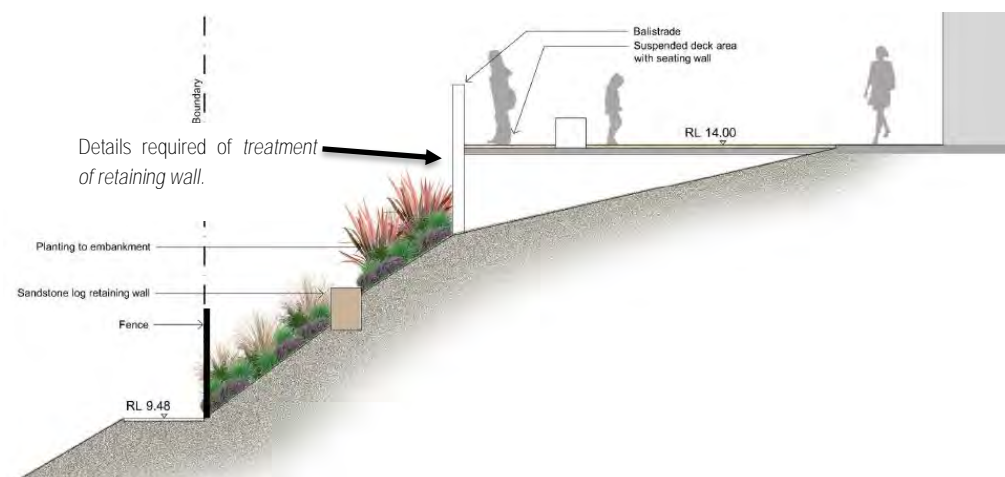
Proposed section through the landscaped area between the gymnasium and the Elamang street boundary. (Source: Site Image, Landscape Sections, excerpt from LH-601, issue C, with GML notations)
